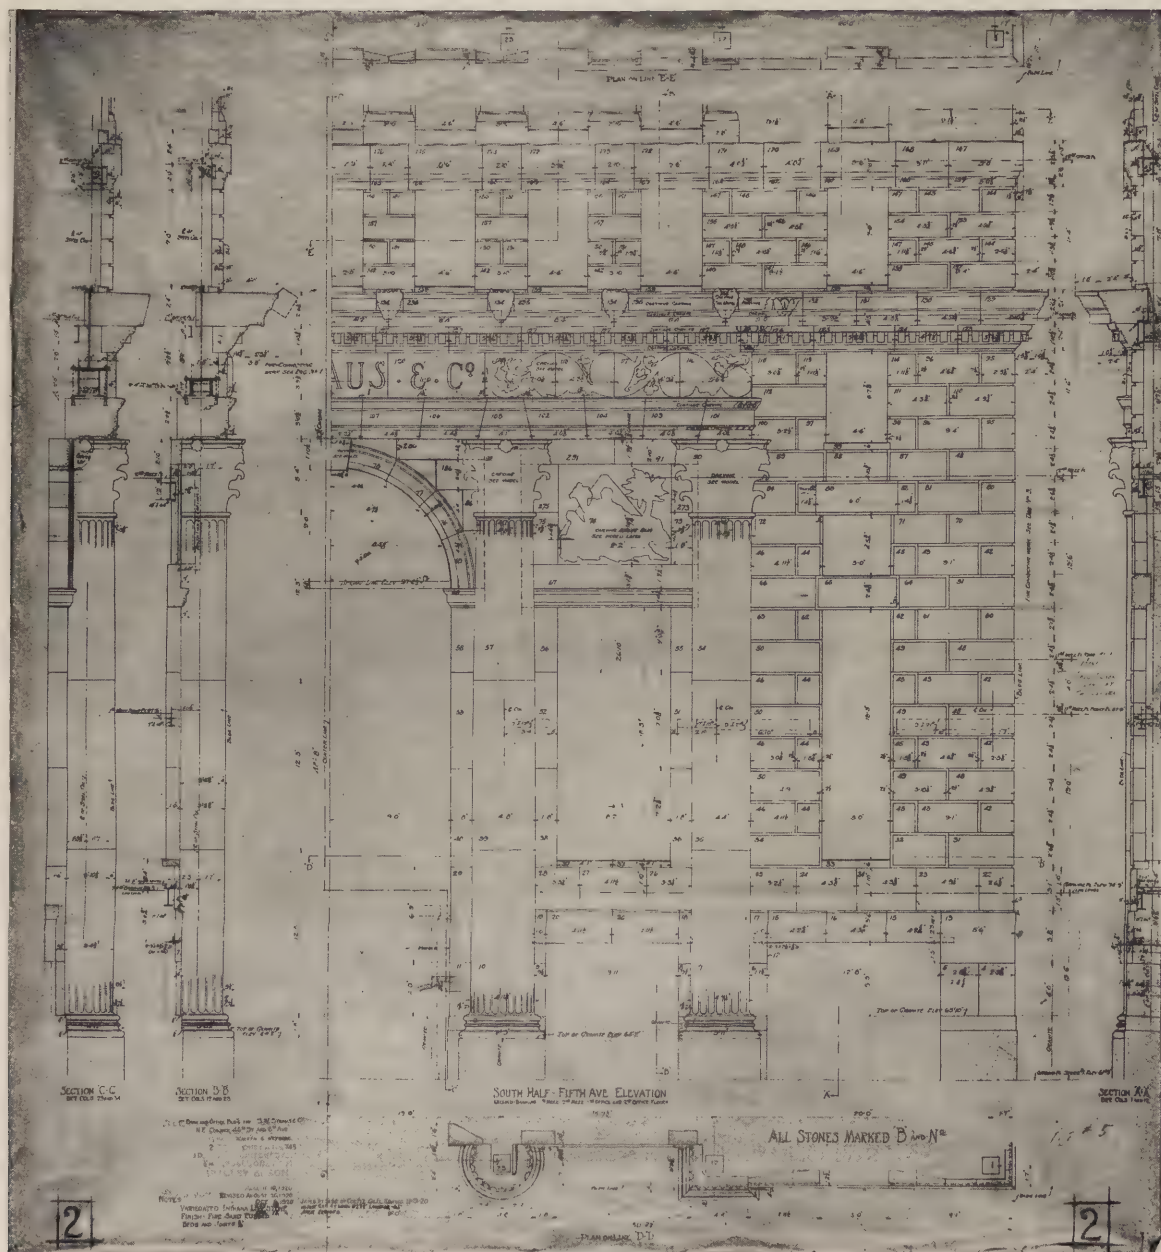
Fifth Avenue Elevation, South Half. Bank and Office Building for S. W. Straus & Co. Warren & Wetmore, Architects.
